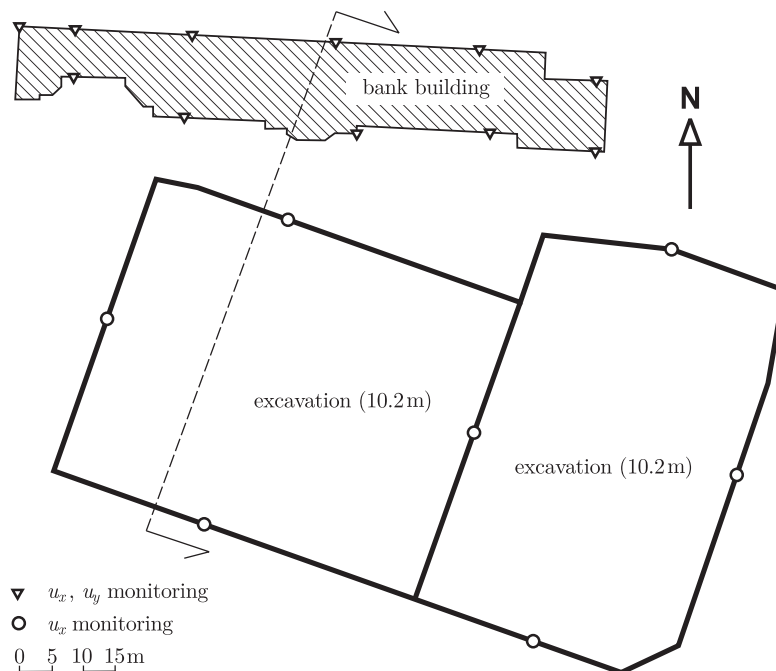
Plan view of the excavation and measurement instrumentation with the location of the 2D section used in the plane strain calculations
